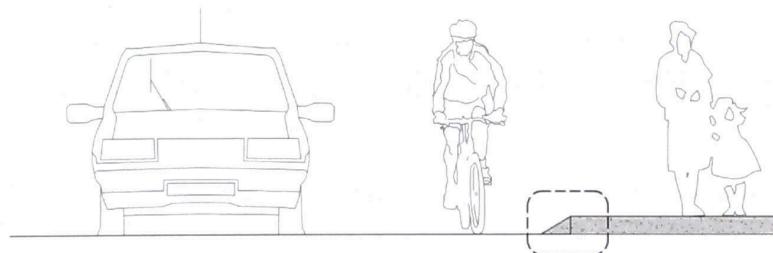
Road, Bicycle land and sidewalk section with curb detail.
